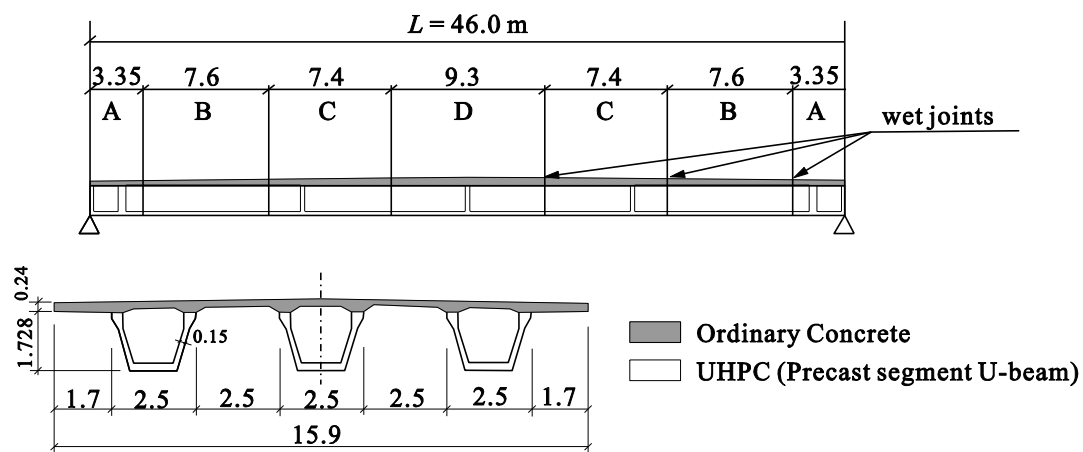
Construction details and cross-section of the GSE Bridge [Watanabe et al. 2007]
